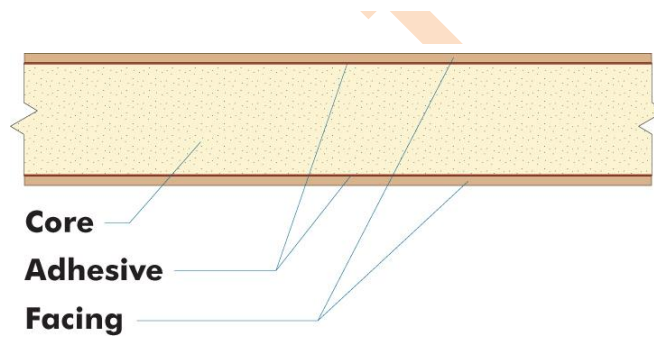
Example of a Cross Section of SIP (adhesive is not required with the polyurethane core)
